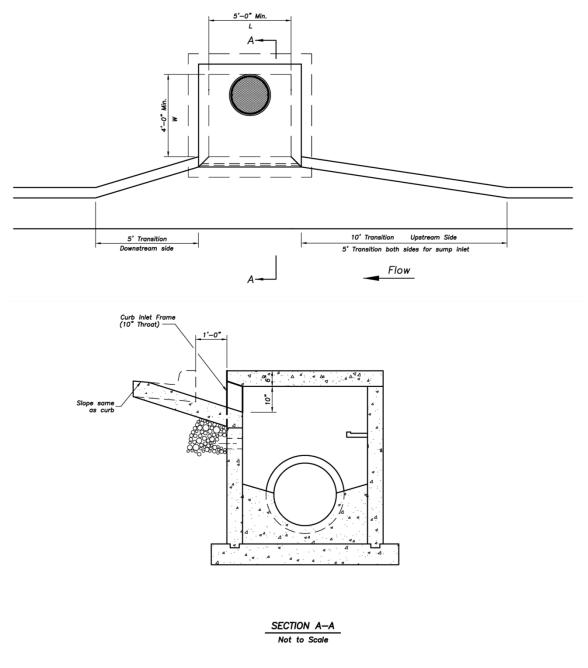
Curb Inlet (10' Throat) Minimum Hydraulic Dimensions
